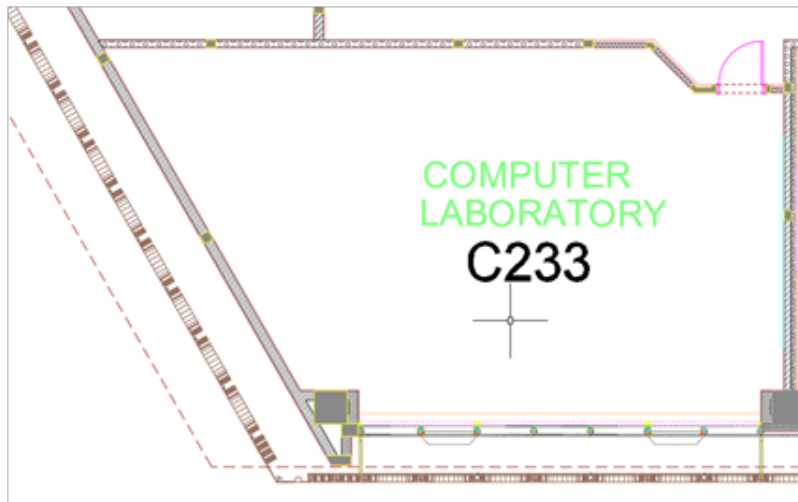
Layout plan of CADD laboratory in C233 (not to scale)
